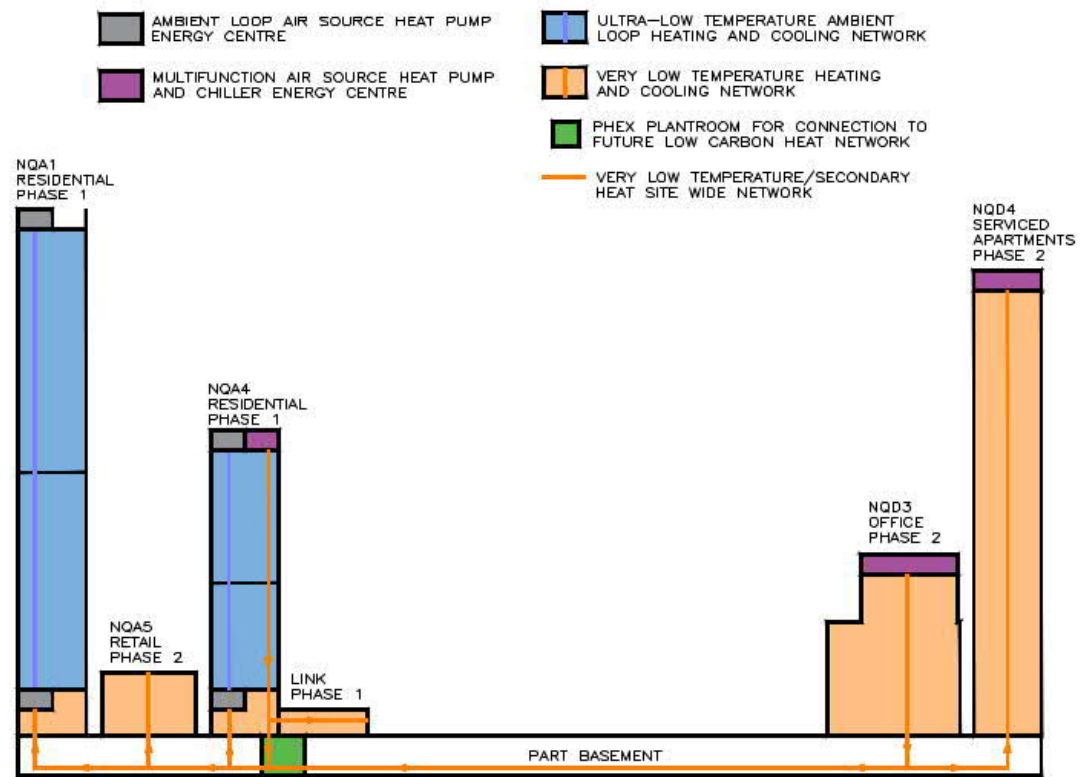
Phase 2. Retail Building NQA5, Office Building NQD3, and Serviced Apartment Building NQD4
